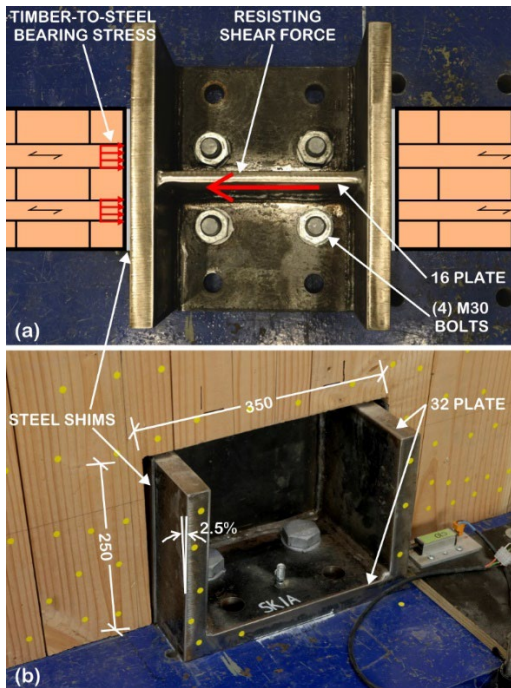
Steel shear key details: (a) plan view and (b) isometric view.
